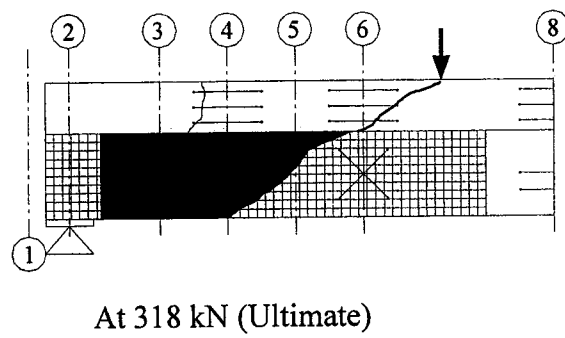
Cracking of T4NSG90 Specimen at Ultimate
